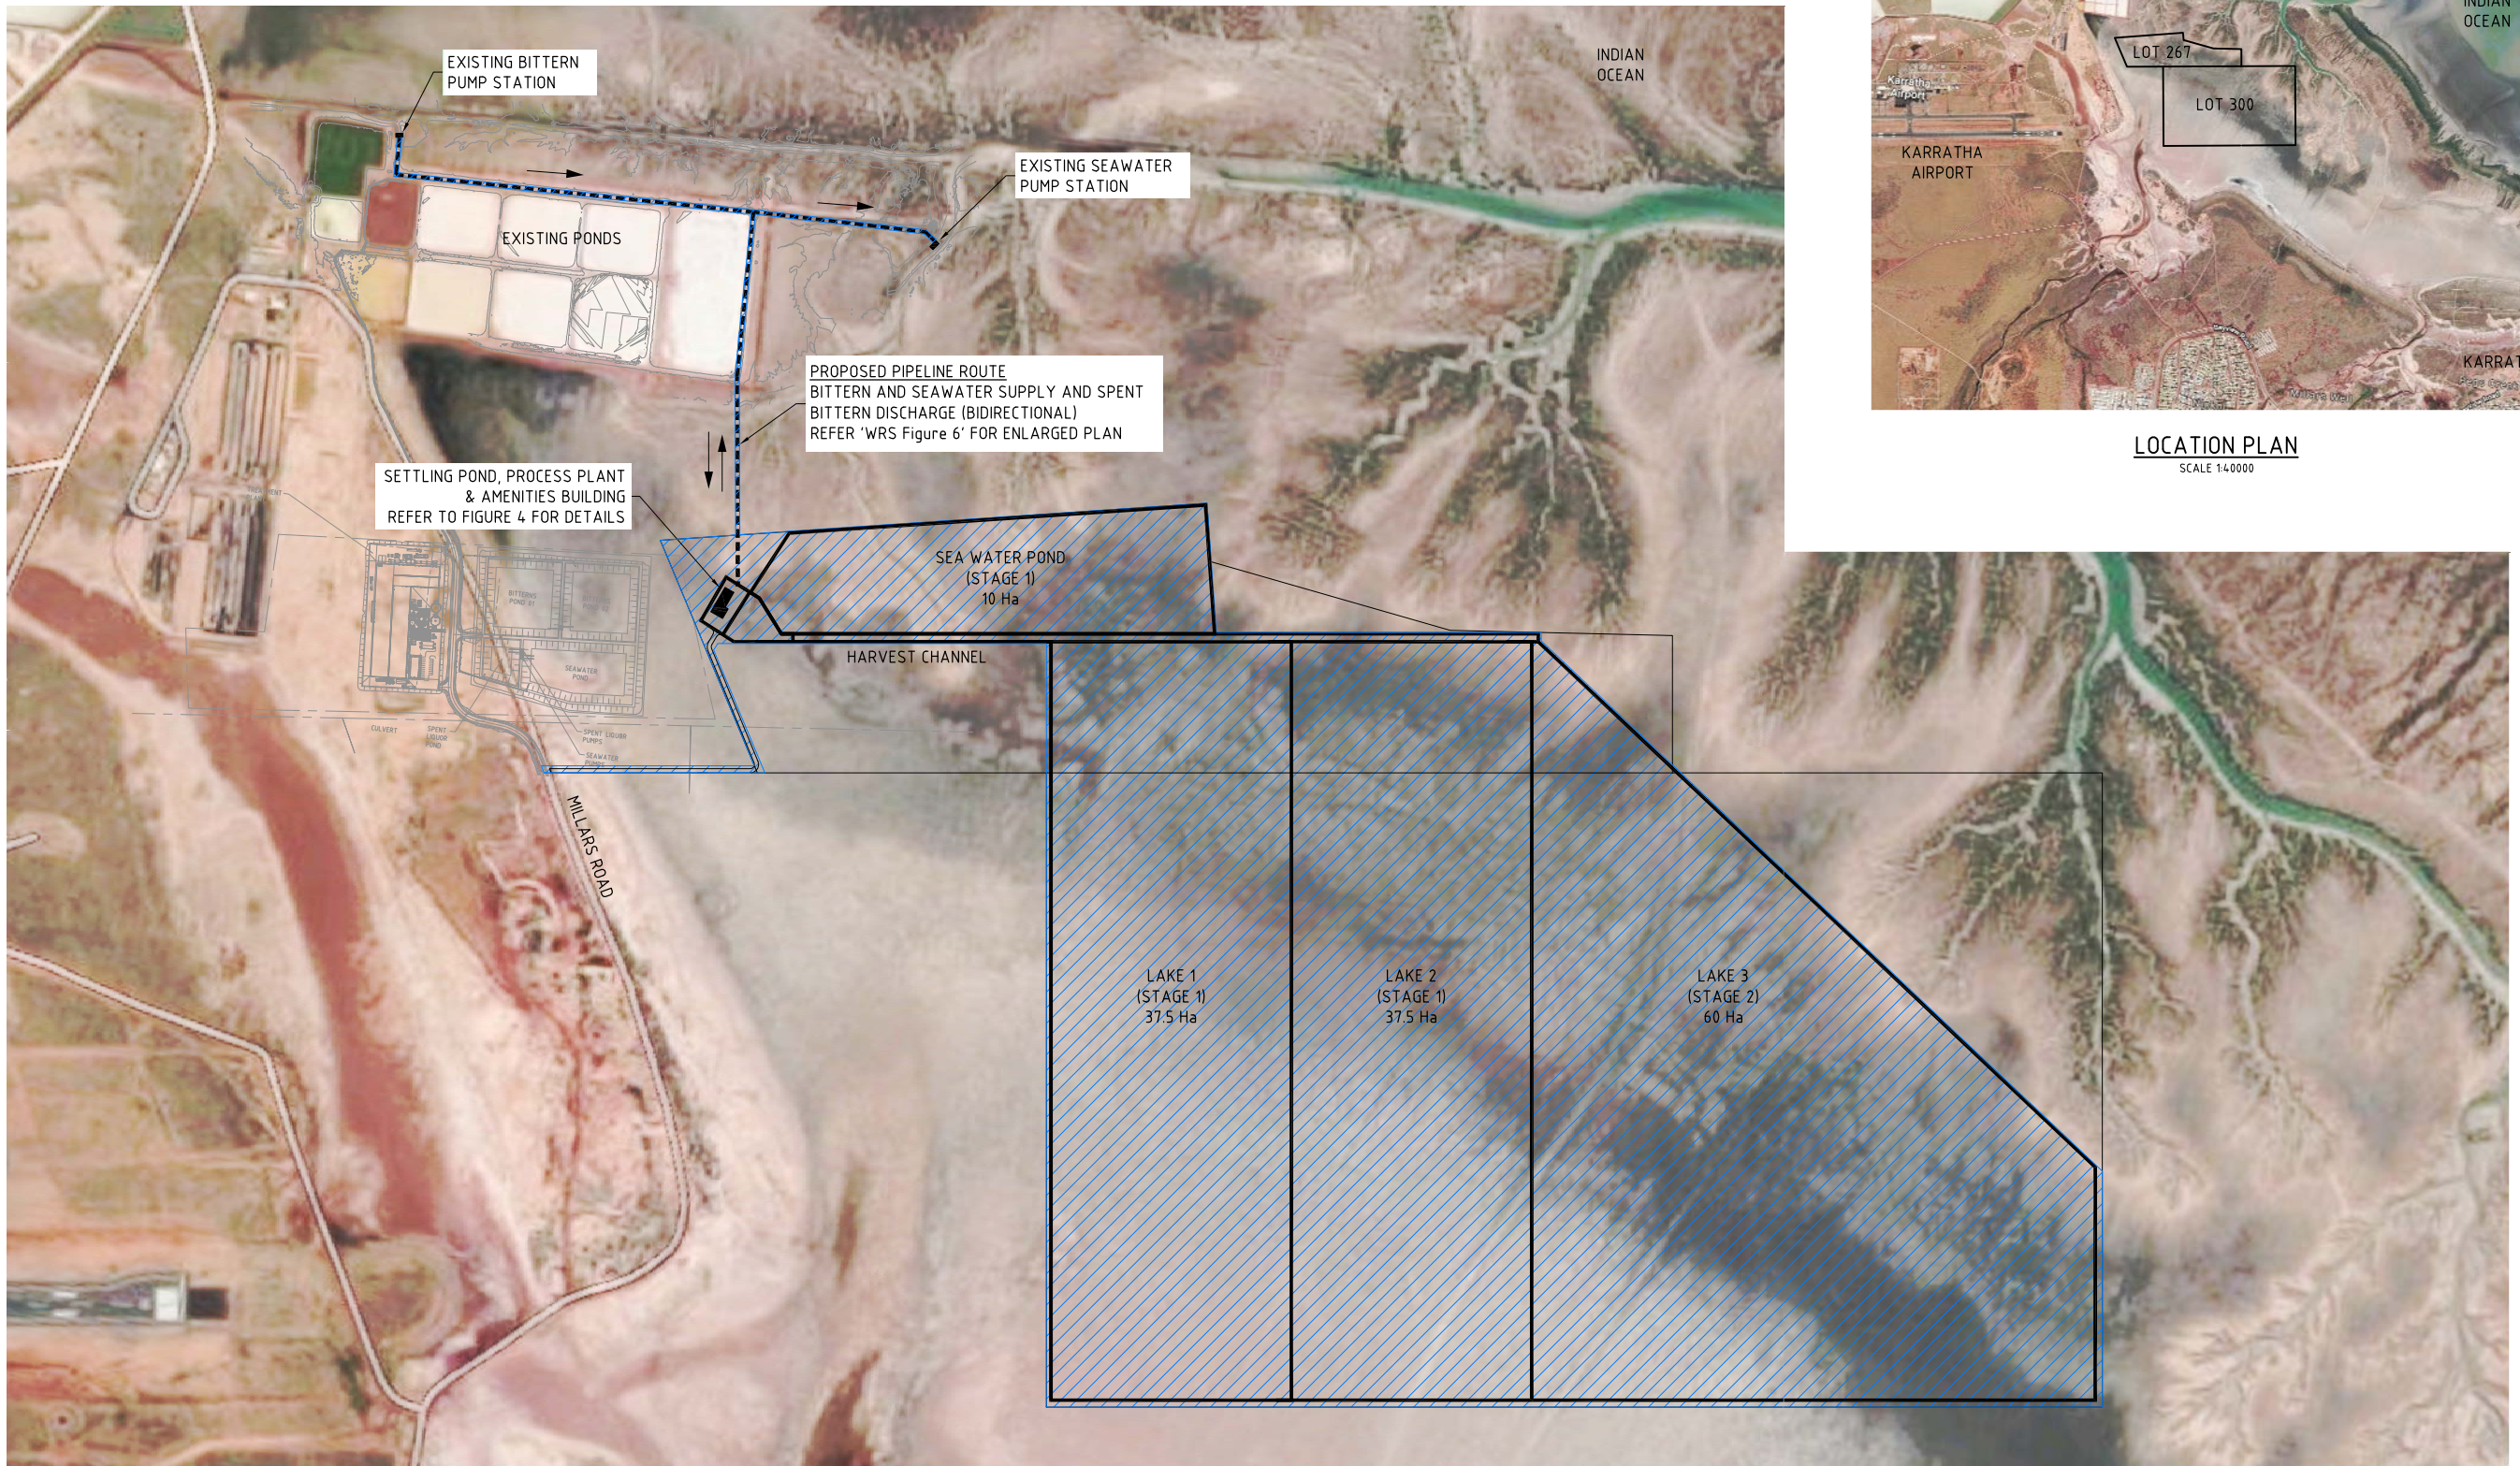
Site Plan – Proposed Lease Area Usage (provided by WRS)
